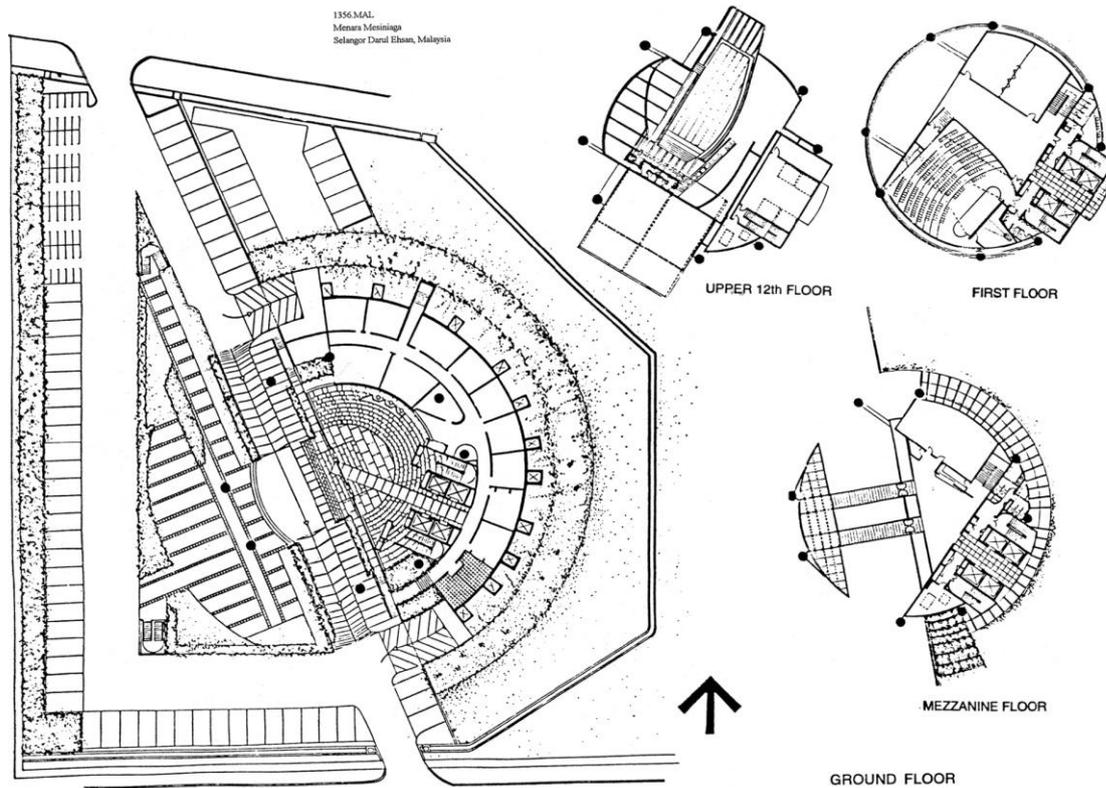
The cylindrical building form corrupted by irregular recessions, adapted from Powell (1999).
